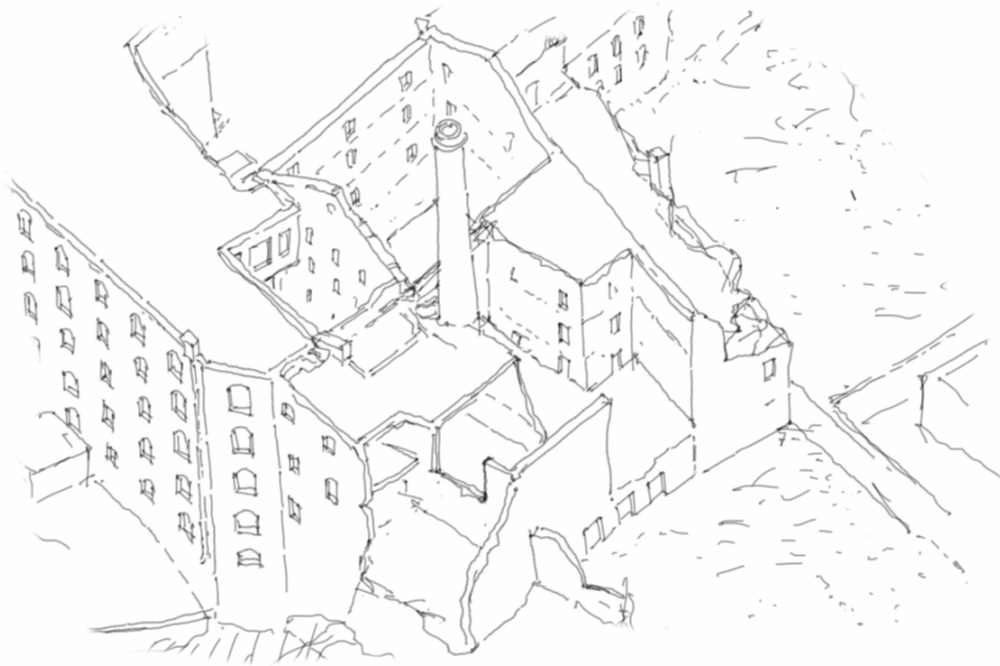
Building shell. Drawing analysis of bird's eye view looking south.
